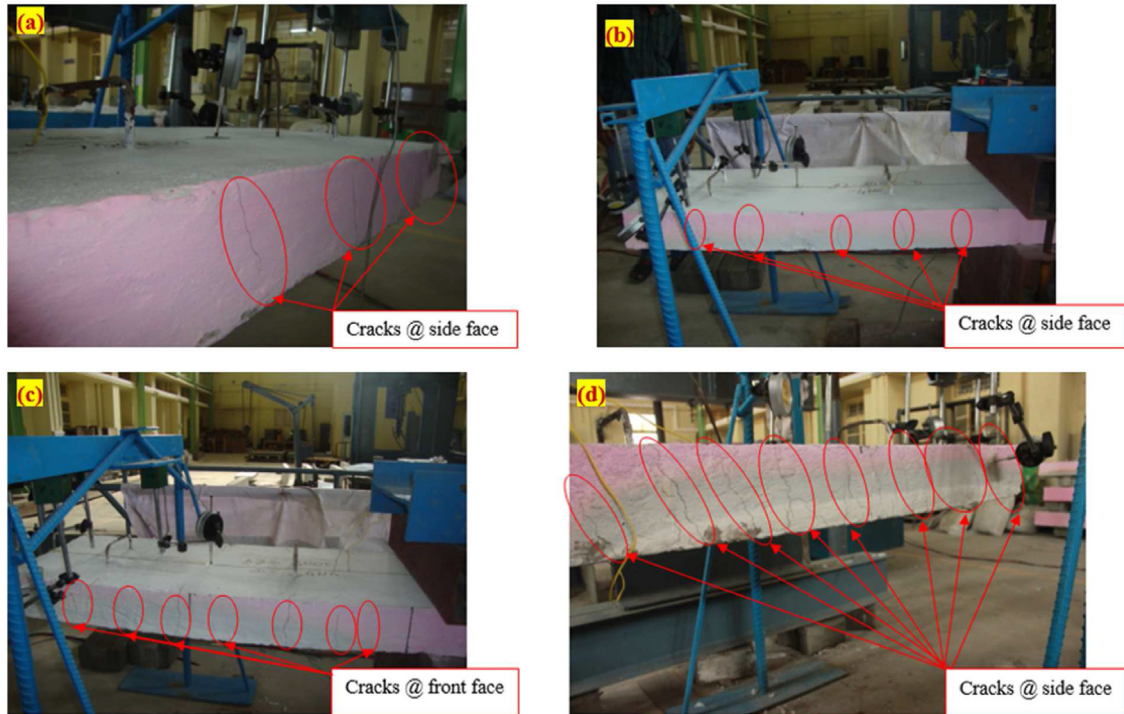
Colour change and crack at a side face of 100 mm thick concrete slab – thermal loading (a) S1 (b) S2 (c) S3 (d) S4.
